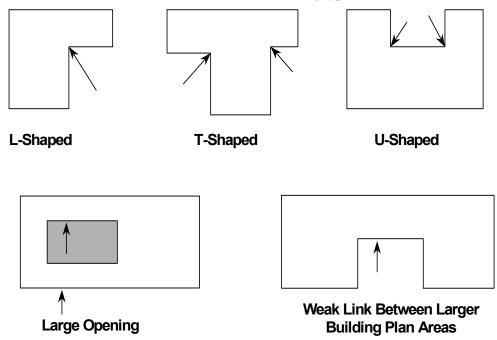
Plan views of various building configurations showing plan irregularities; arrows indicate possible areas of damage.
